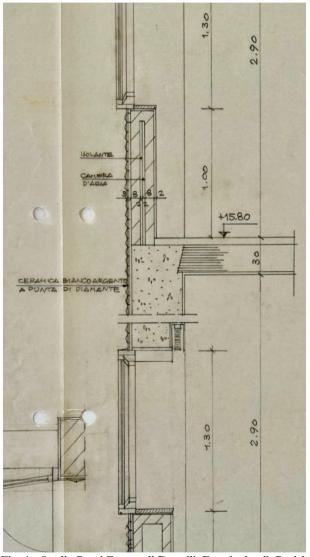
Studio Ponti Fornaroli Rosselli, Façade detail. Parish residence facing the church square, 28th April 1961, scale 1:20 (part.) © CSAC Centro Studi e Archivio della Comunicazione, Università degli Studi di Parma, Fondo Gio Ponti.
